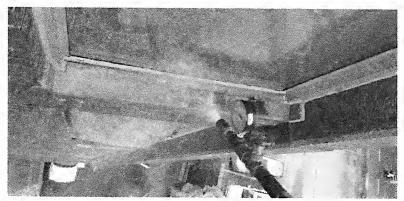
Testing with spray nozzle at window, west facade, eleventh floor
